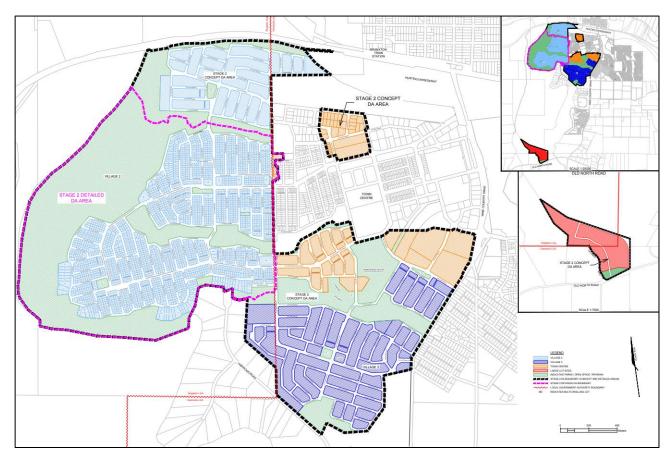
Proposed Concept and Detailed Layout Area (Source: Daly Smith)
